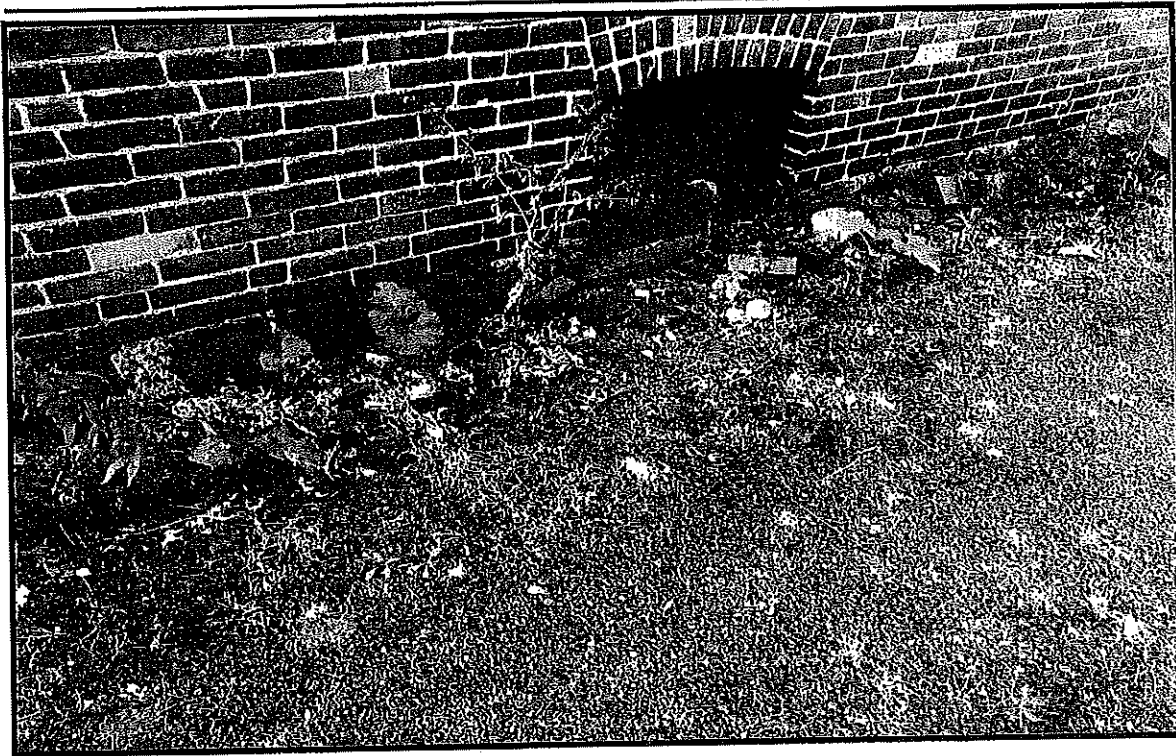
224 Washington Street North Wall Bricks From Failed Window Head Above.
